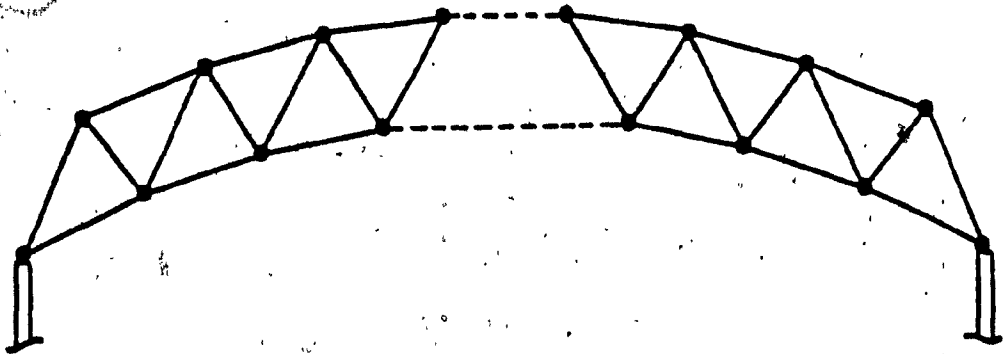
THE RING TRUSS PROFILE ARCHES UPWARDS FROM THE COLUMNS. THE TRUSS IS SUPPORTED AT ITS LOWER SURFACE AND HAS A CONSTANT DEPTH.
